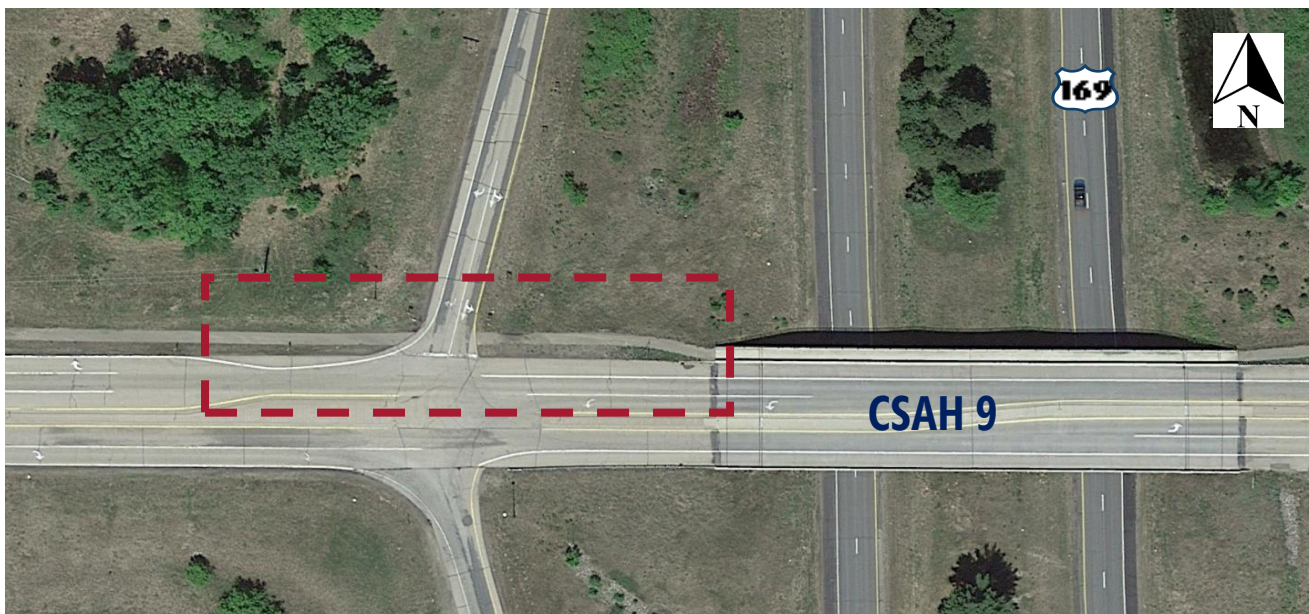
Location 14: Intersections at West Ramps of US 169 to 289th Ave NW (CSAH 9)
